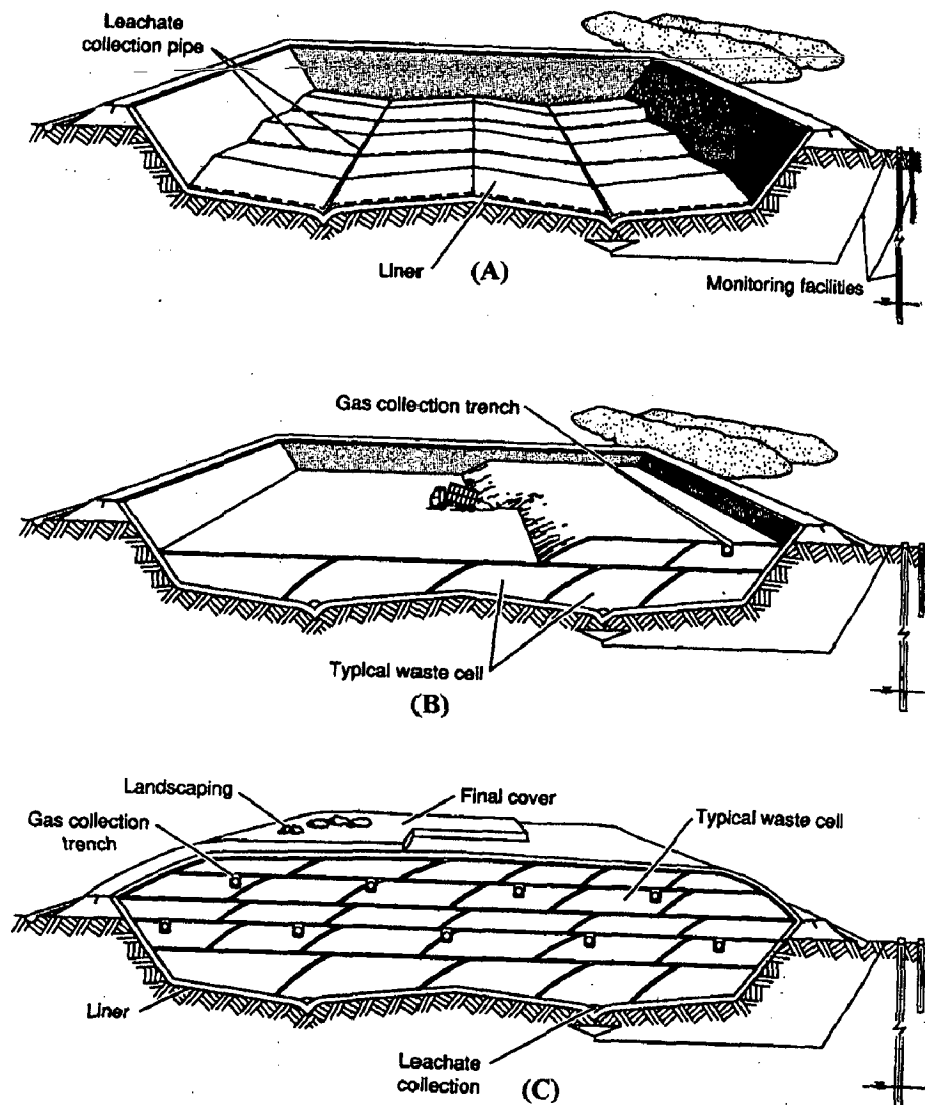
DEVELOPMENT AND COMPLETION OF A LANDFILL; (A) EXCAVATION AND INSTALLATION OF LANDFILL LINER, (B) PLACEMENT OF SOLID WASTE IN LANDFILL, AND (C) SECTION THROUGH COMPLETED LANDFILL
